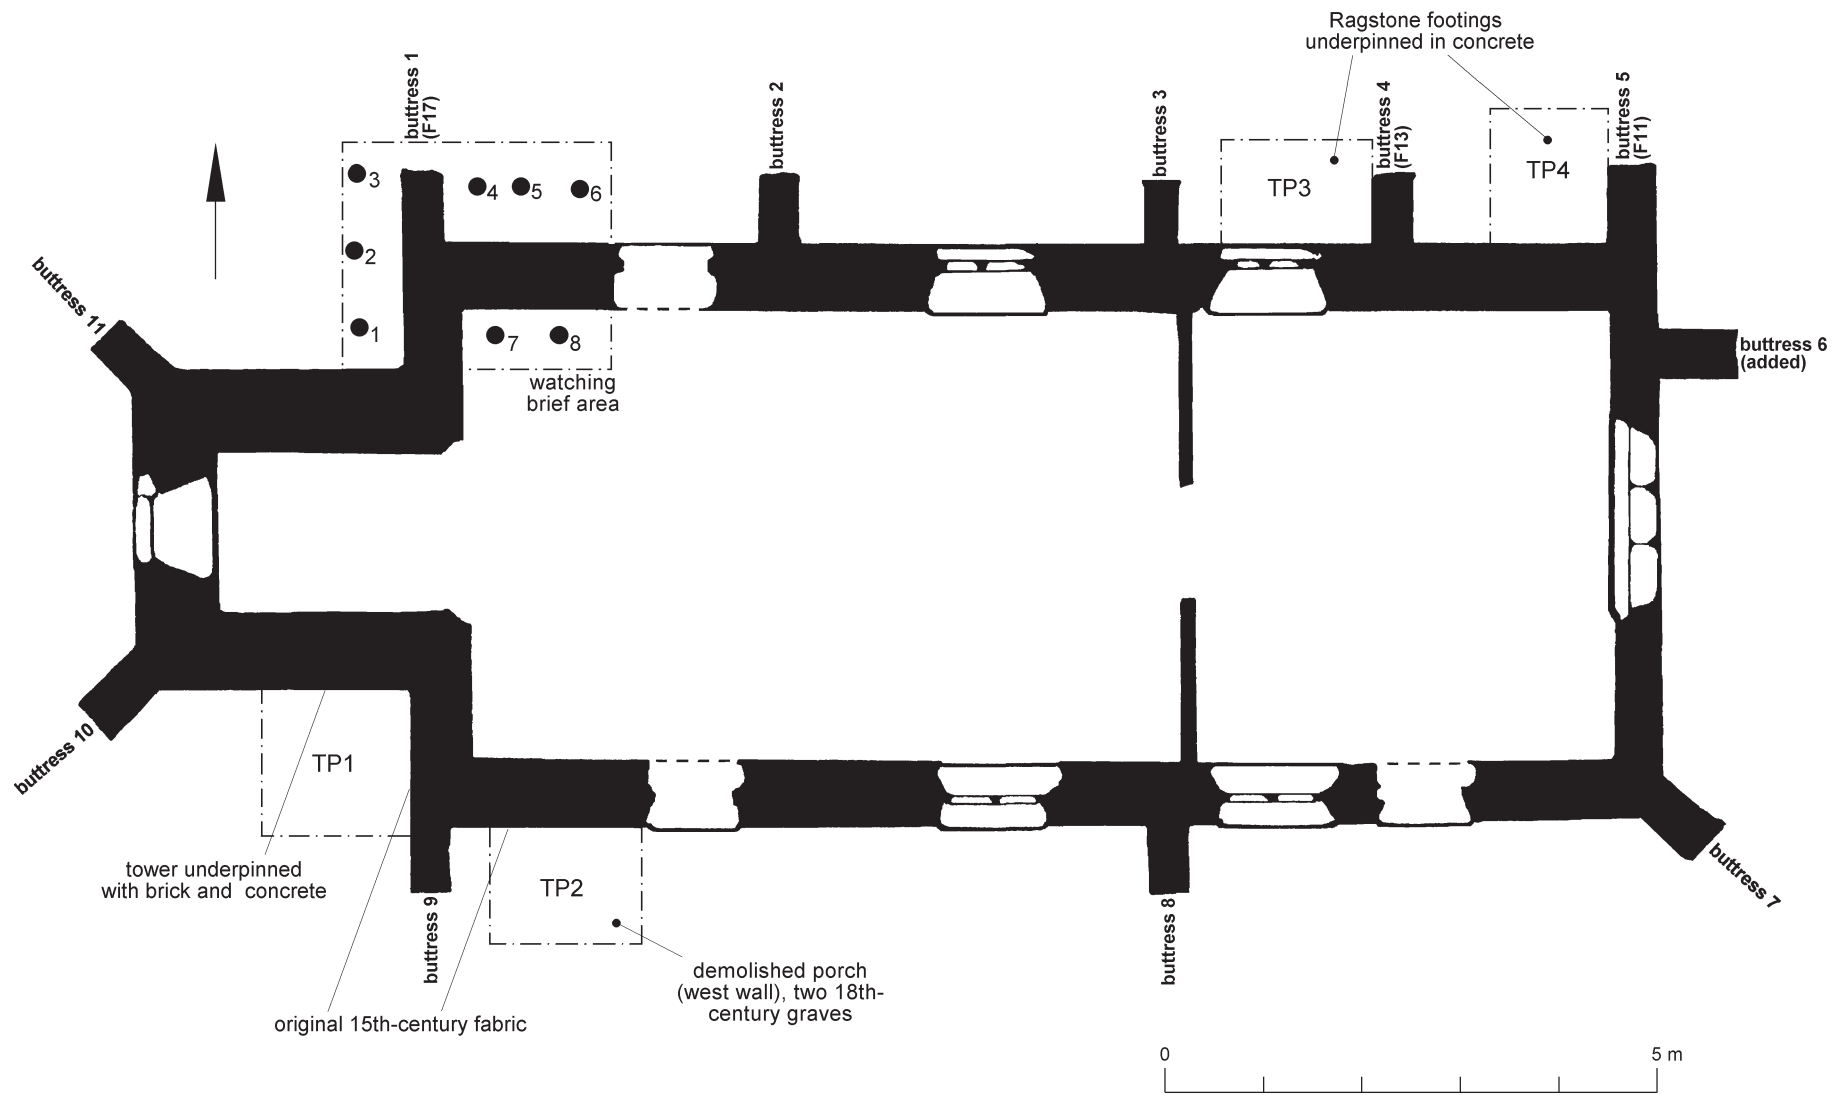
Plan of church, showing test-pit (TP) locations and watching brief area.
